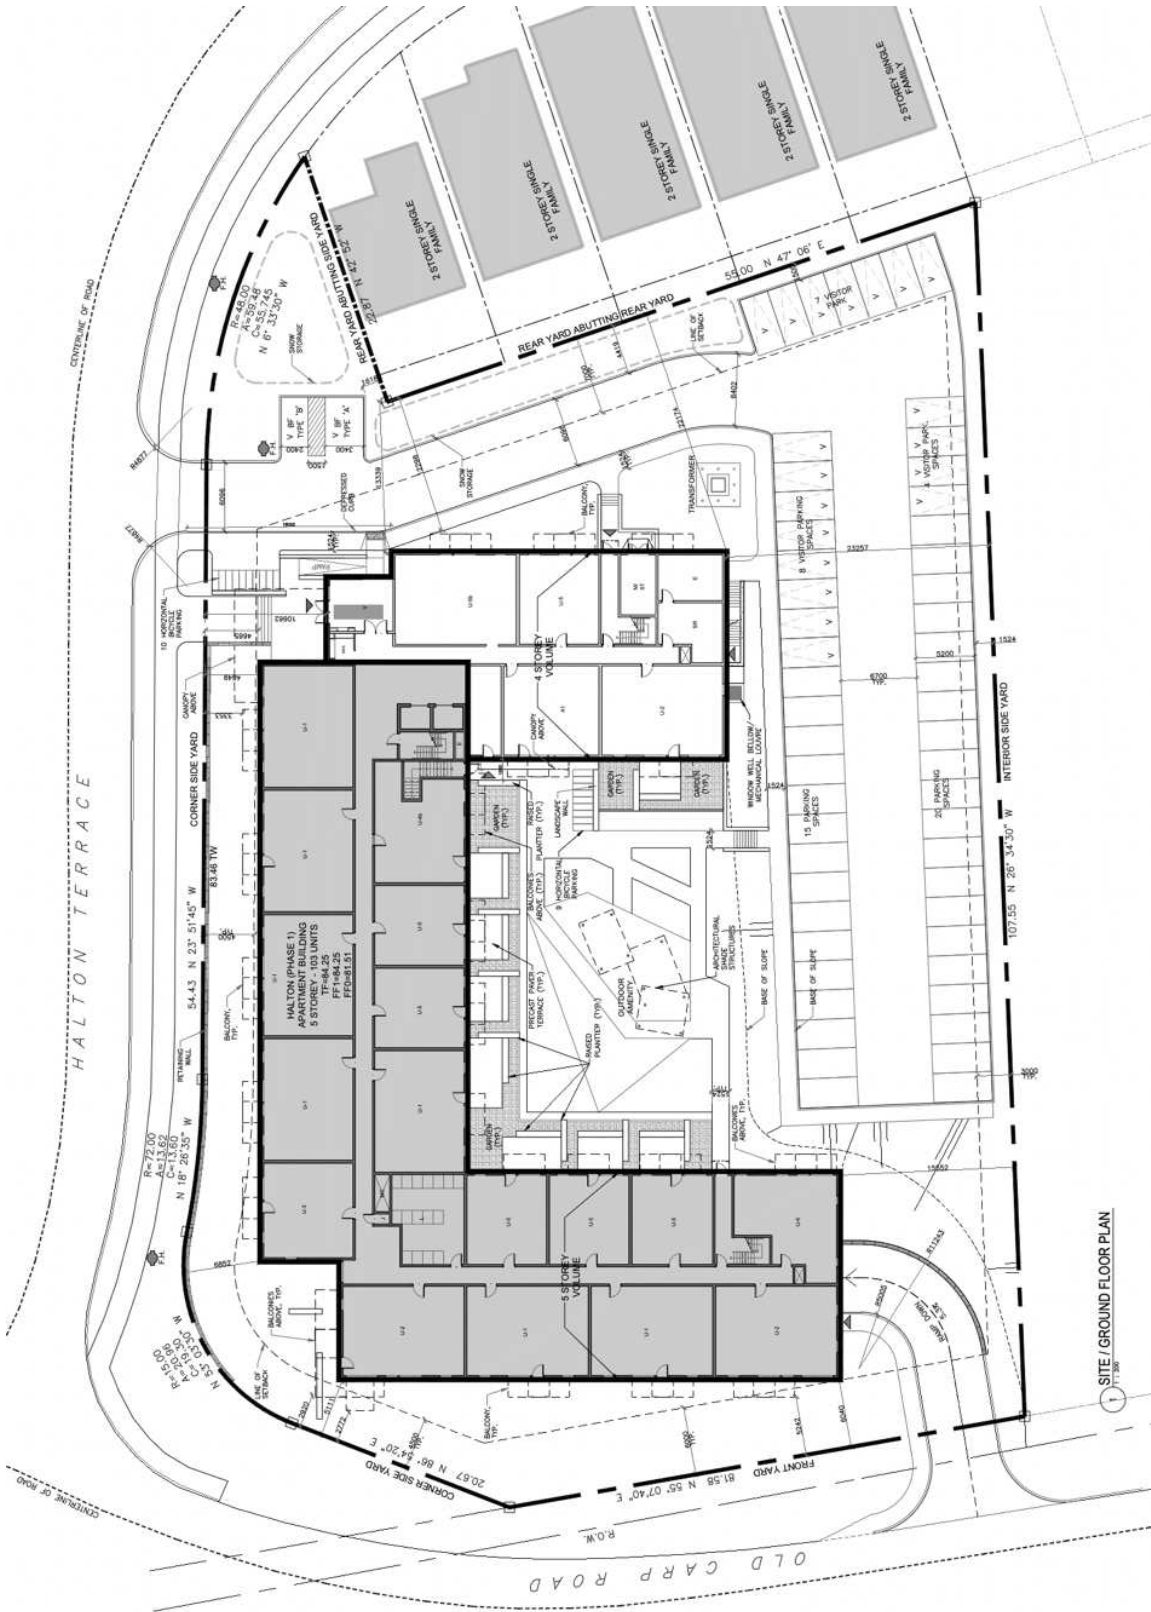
Extract of Site Plan (Source: Colizza Bruni)
